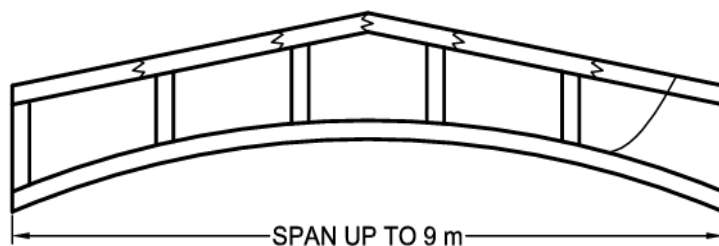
TYPICAL CROSS SECTION OF WEB BEAMS
